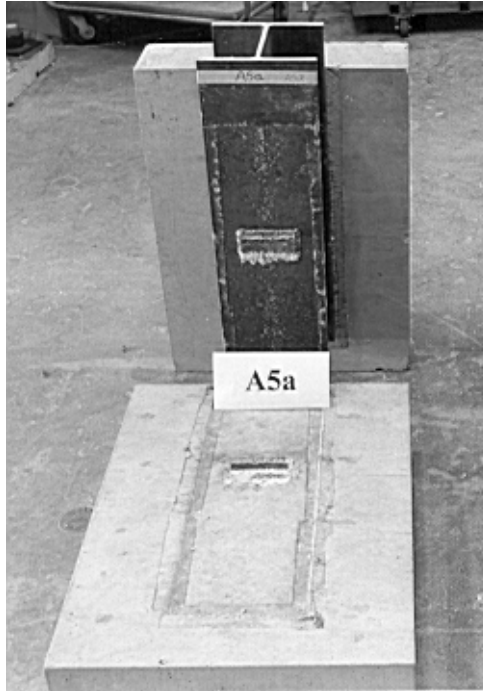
Typical Channel Fracture Failure in Solid Slab Specimen.
